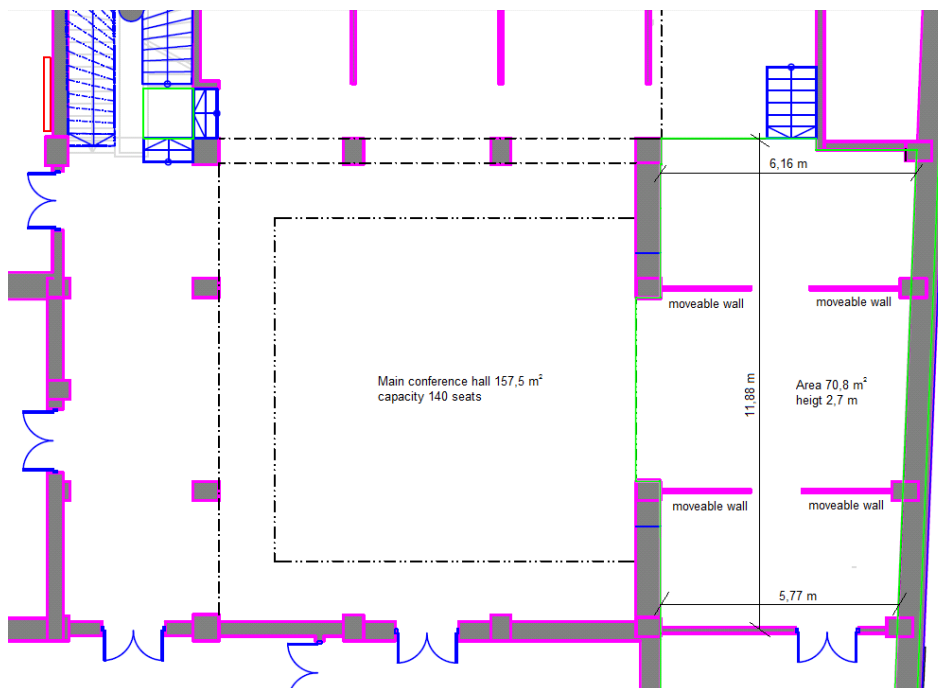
Floor plan of the room behind the conference hall, where BKH equipment is installed.
